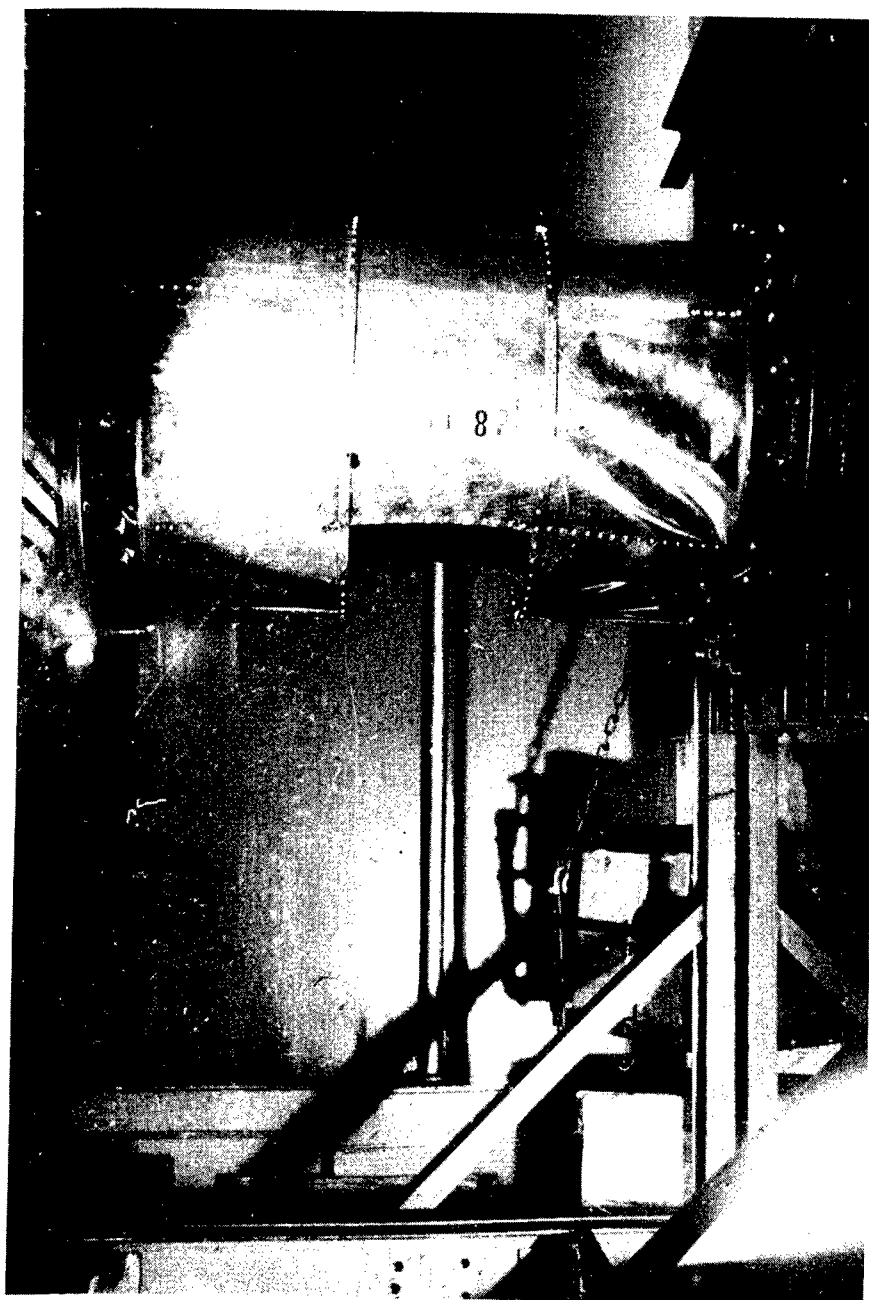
Side view of PIBAL cylinder 82 after buckling.
